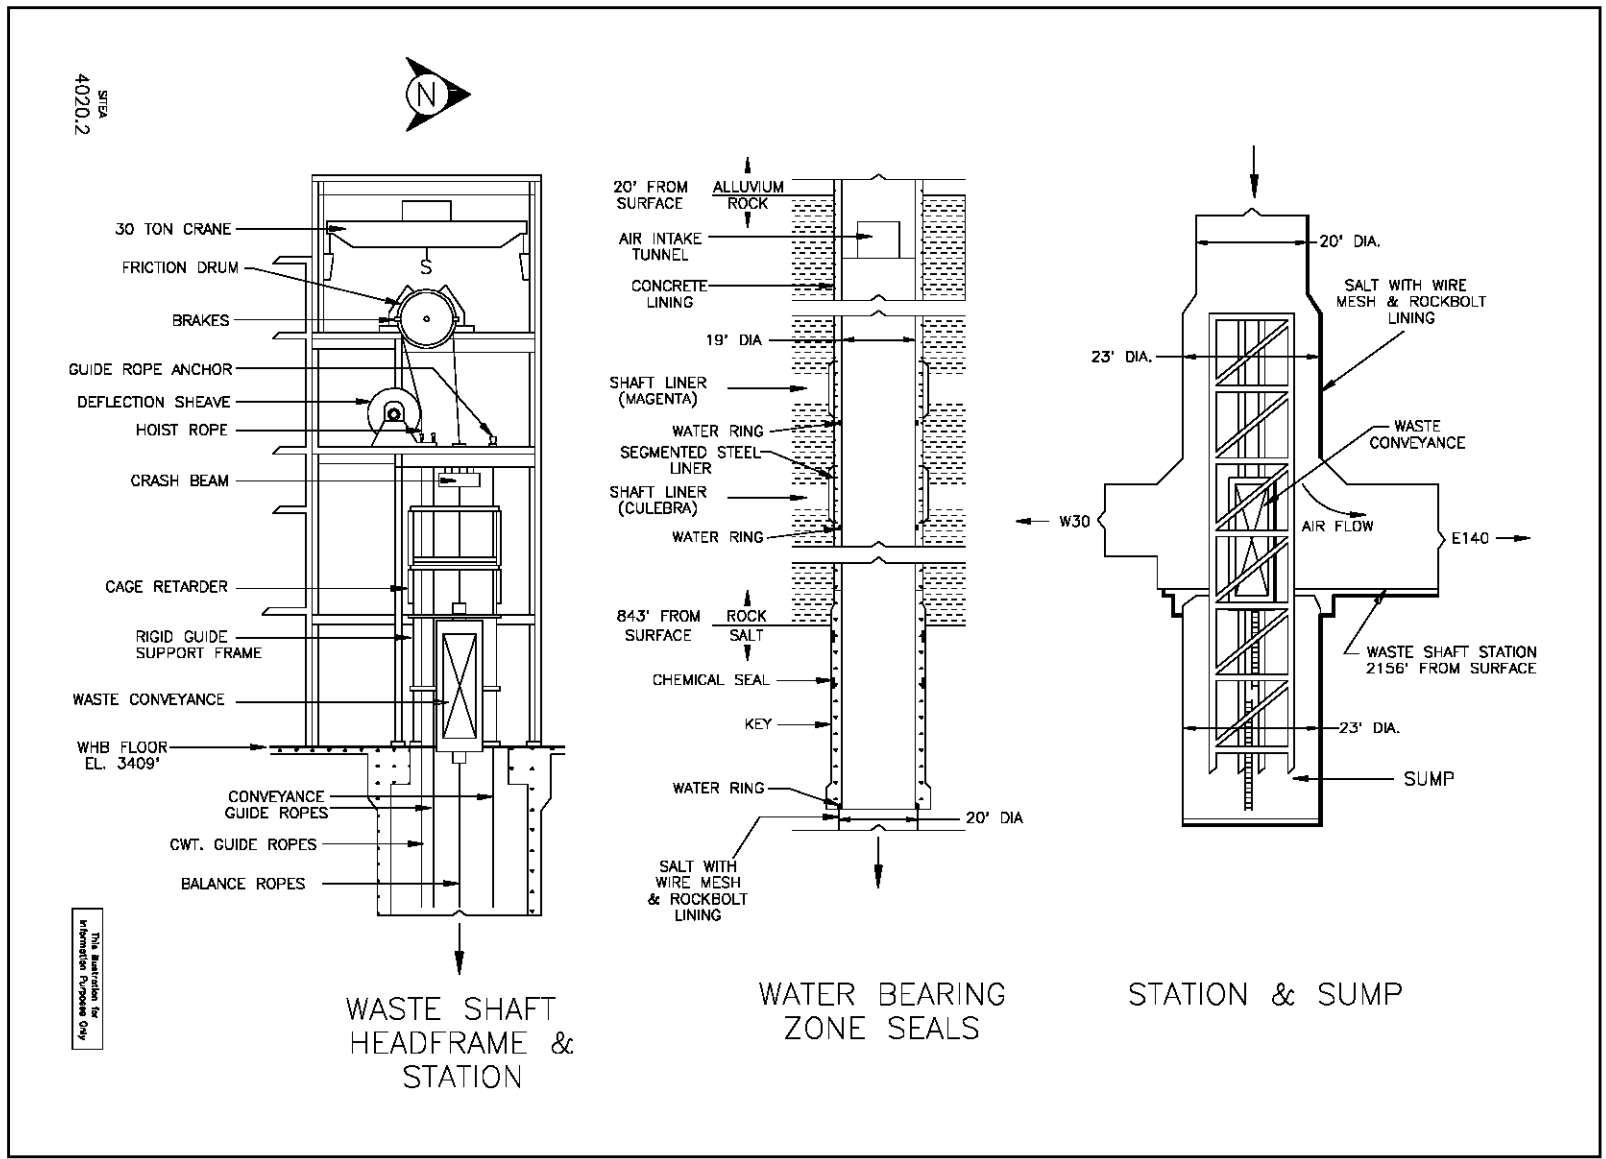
Waste Shaft and Hoist Arrangement
